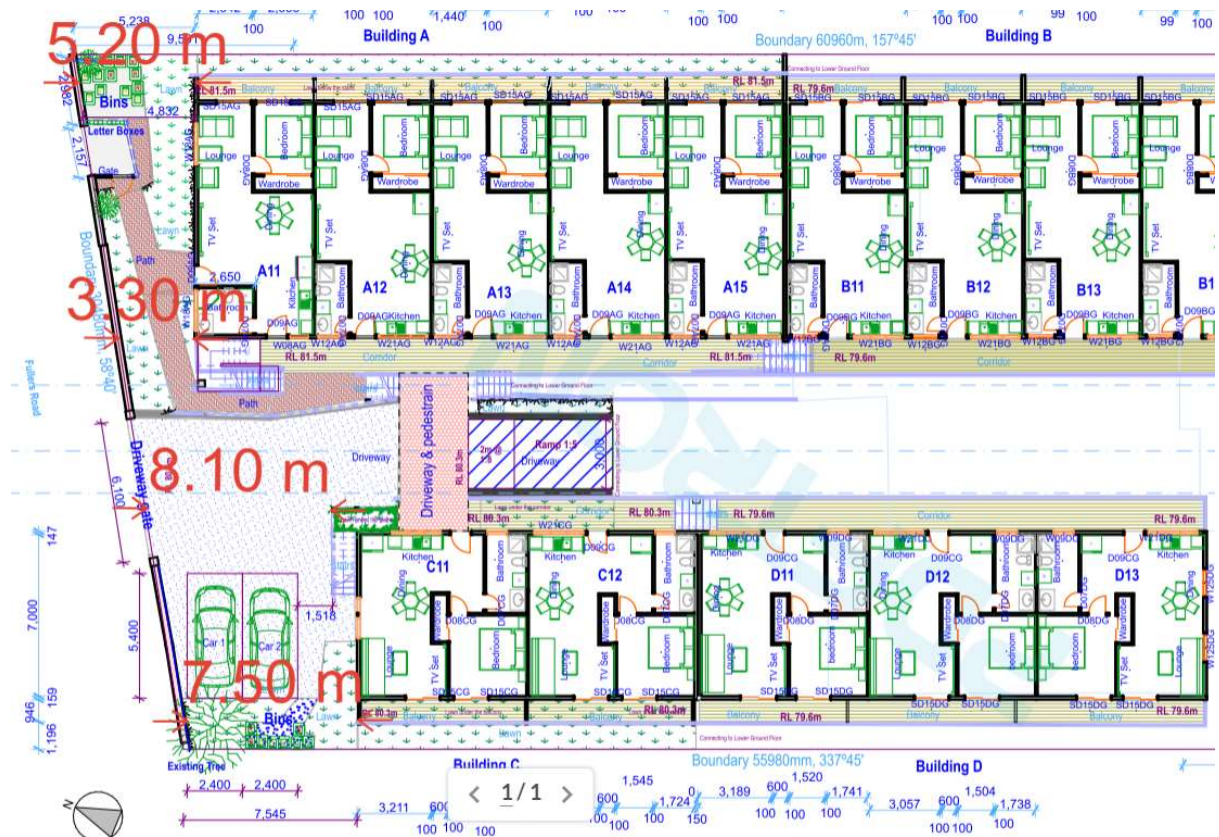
Ground floor plan showing proposed setbacks to Fullers Road (Source: SCC report, J Yang).
